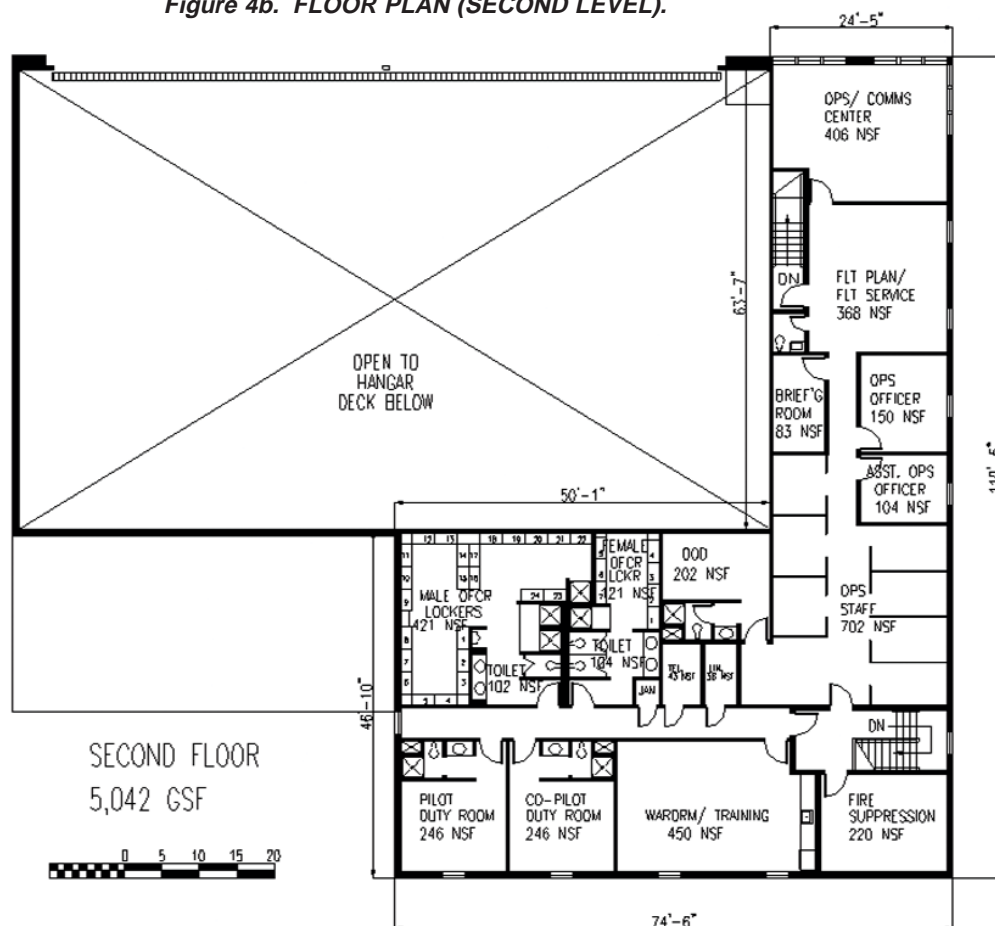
FLOOR PLAN (SECOND LEVEL).
